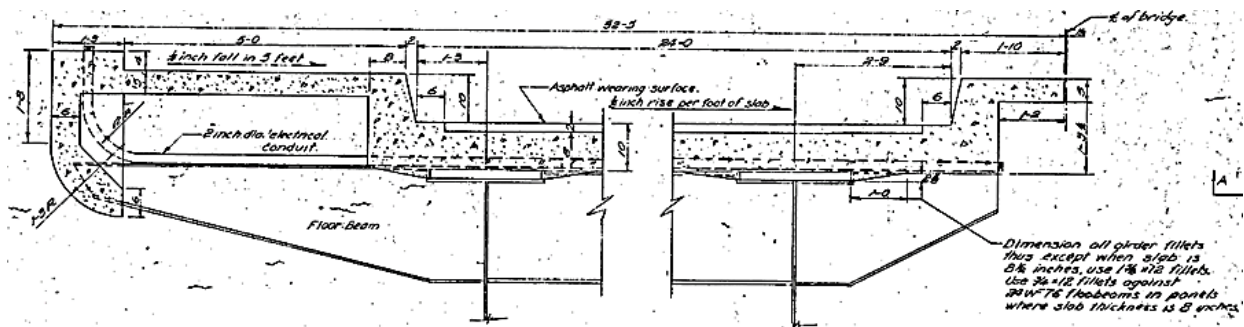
Girder to deck connection (Typ.) taken from as-built drawings (Saskatchewan Ministry of Highways and Infrastructure, 1959)
